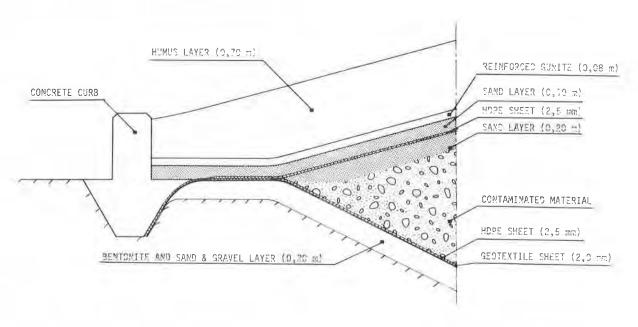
Detail of the HDPE sheets anchorage to the slope edge
